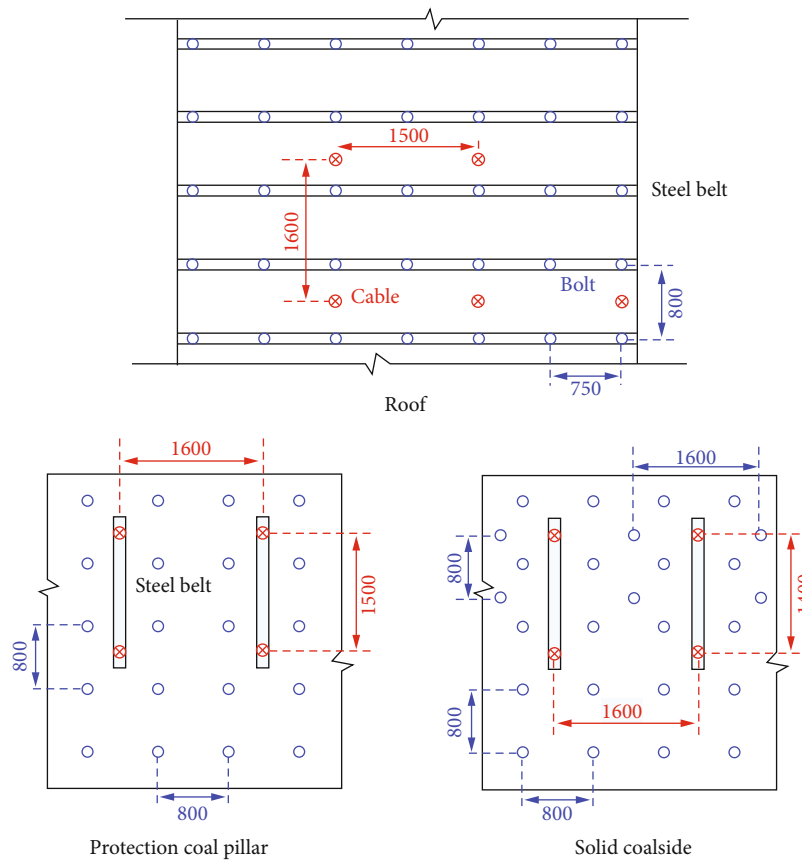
Arrangement of rock bolts and cable bolts in the gob-side entry.
